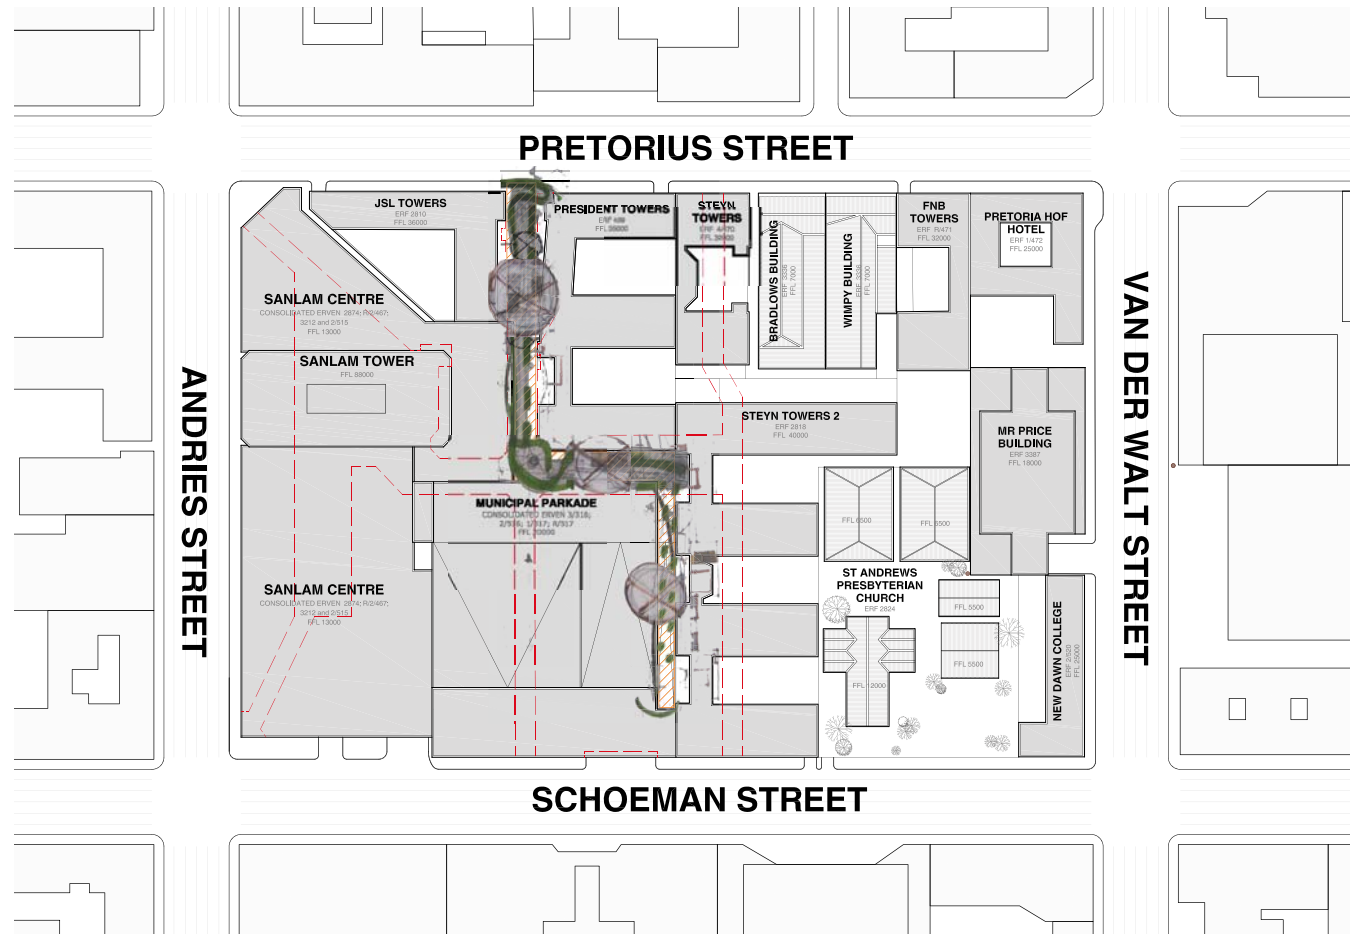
Existing site plan, with diagrams overlaid (Author, 2010).
